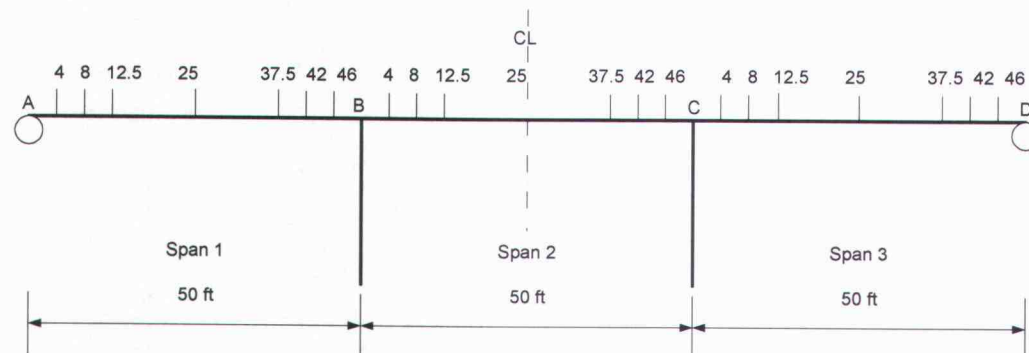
Profile view of McKenzie River bridge with cross-section locations (feet).
